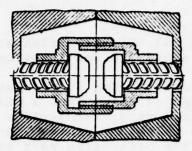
Coupling threaded connection of prefabricated pavement slabs.
